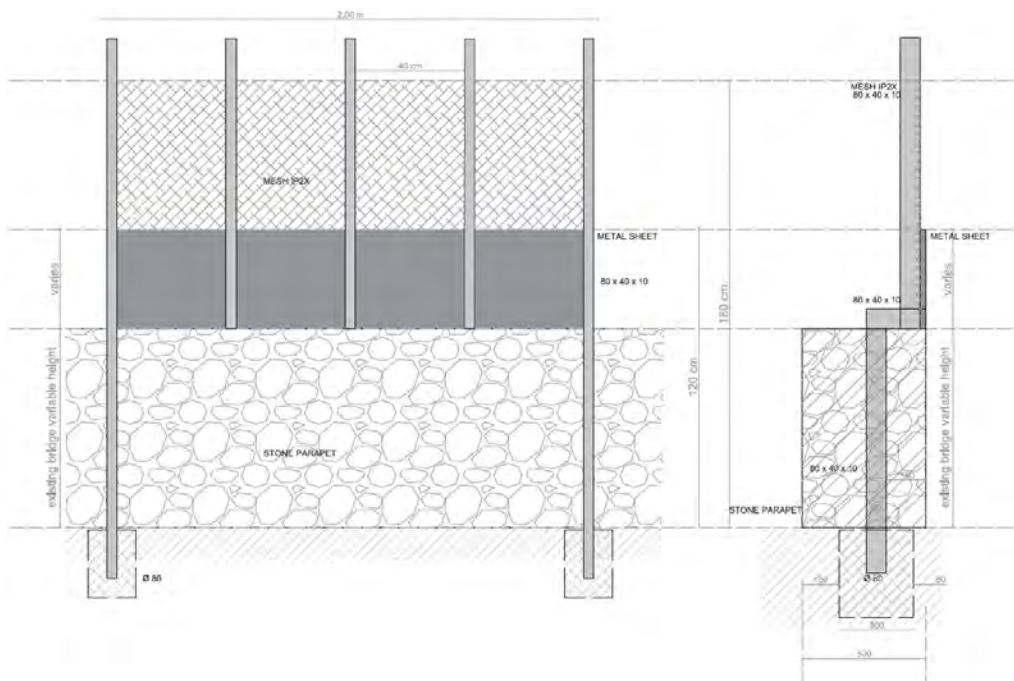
Alternative parapet solution for bridges with width restrictions
